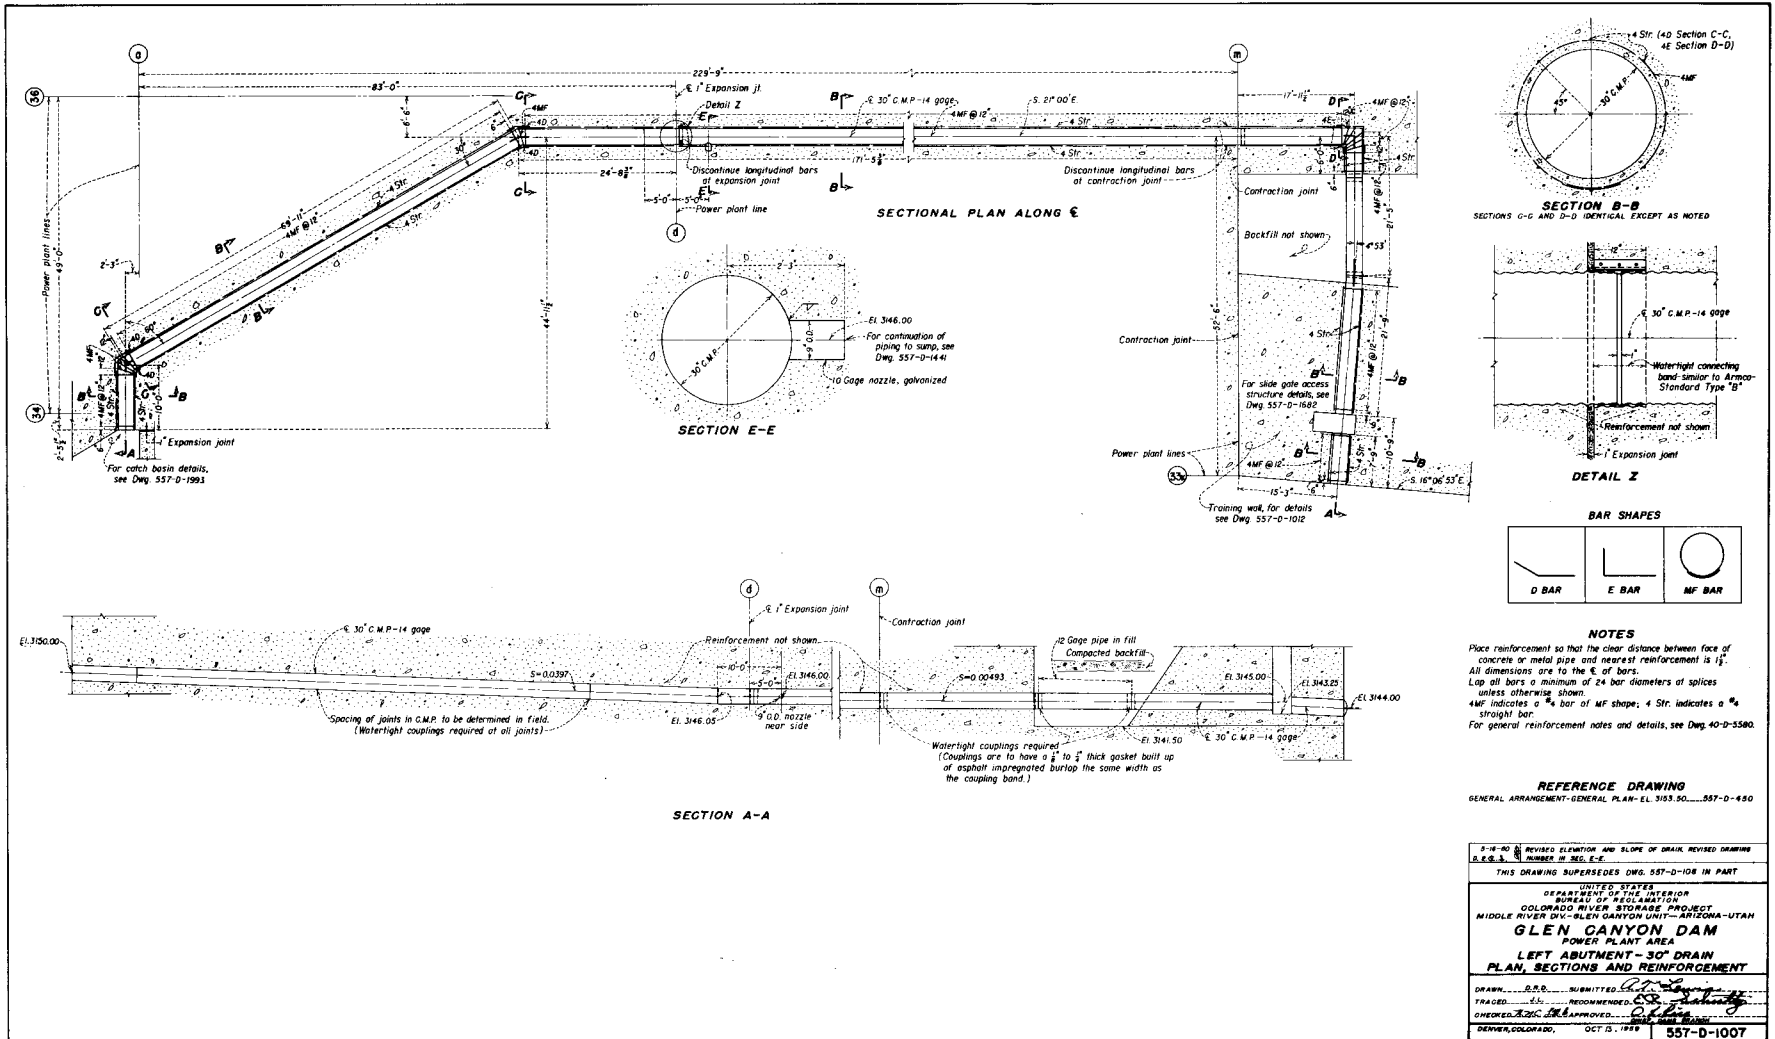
Left abutment 30-inch drain in dam powerplant area—Plan, sections, and reinforcement.
